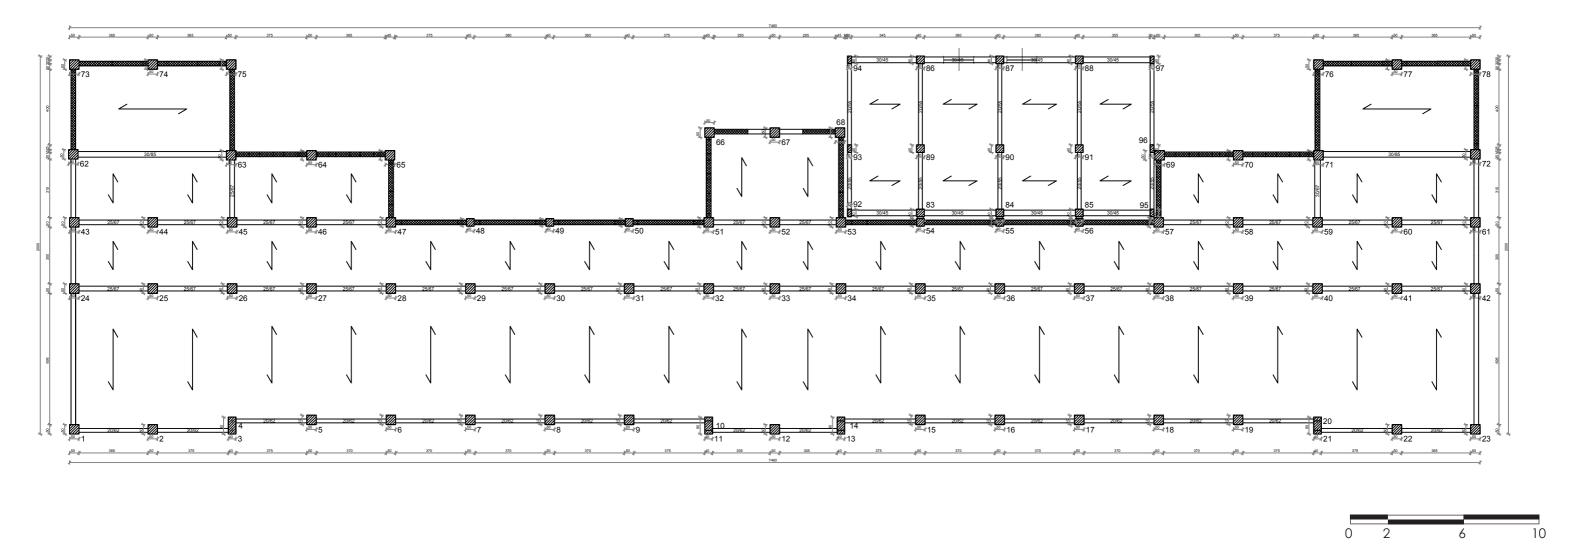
Basement Structural Floor Plan Quote + 3,60 m | Scale 1:200
